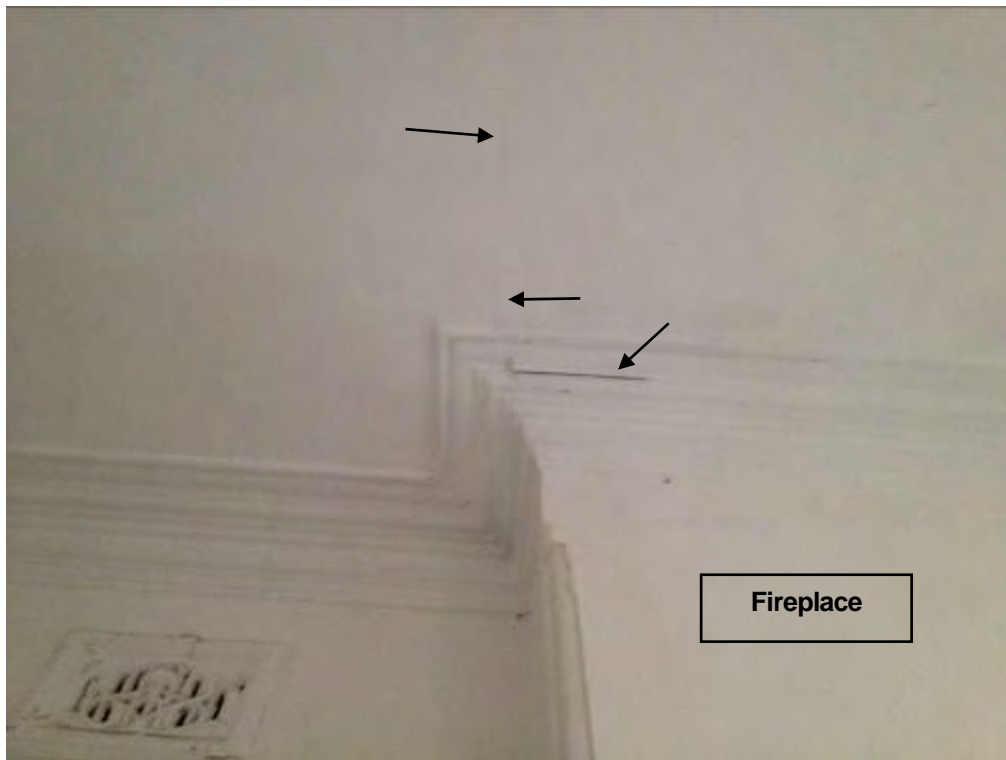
shows hairline cracking to the set joint in the Hallway ceiling and cornice towards the north end of the Hallway ceiling
